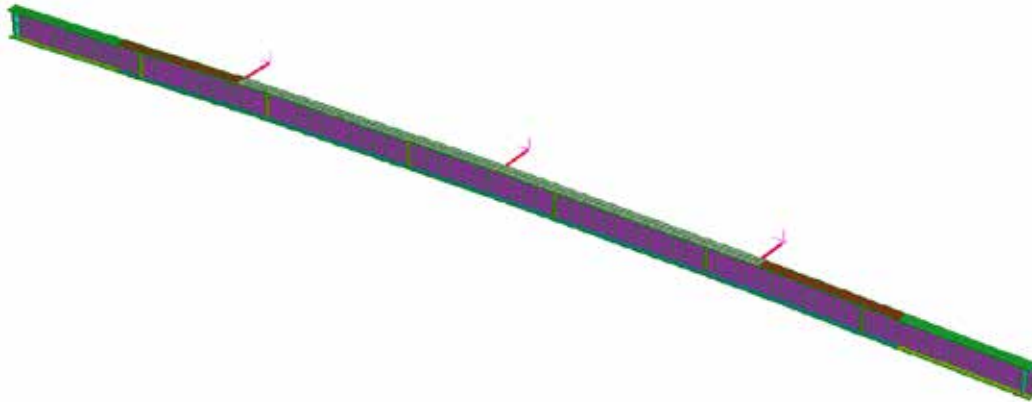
Construction Sequence – Stage 1 Braced To Existing Structure
